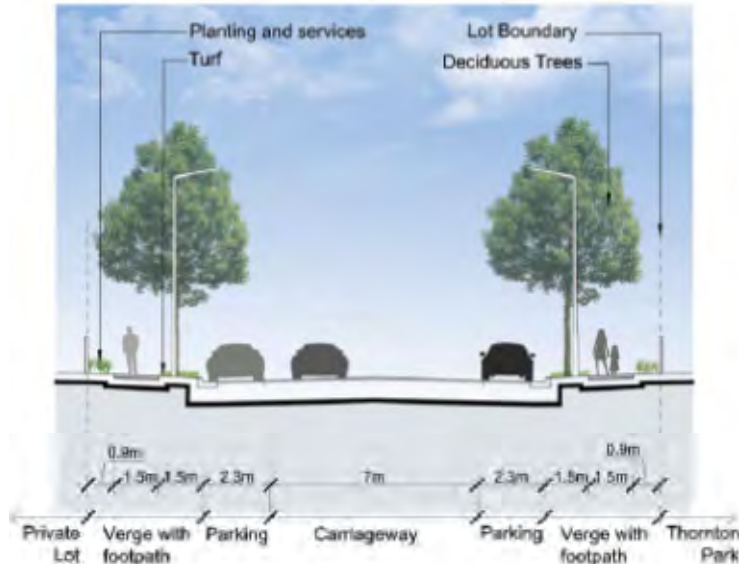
Mountain View Crescent Cross Section (Source: Place Design Group)
